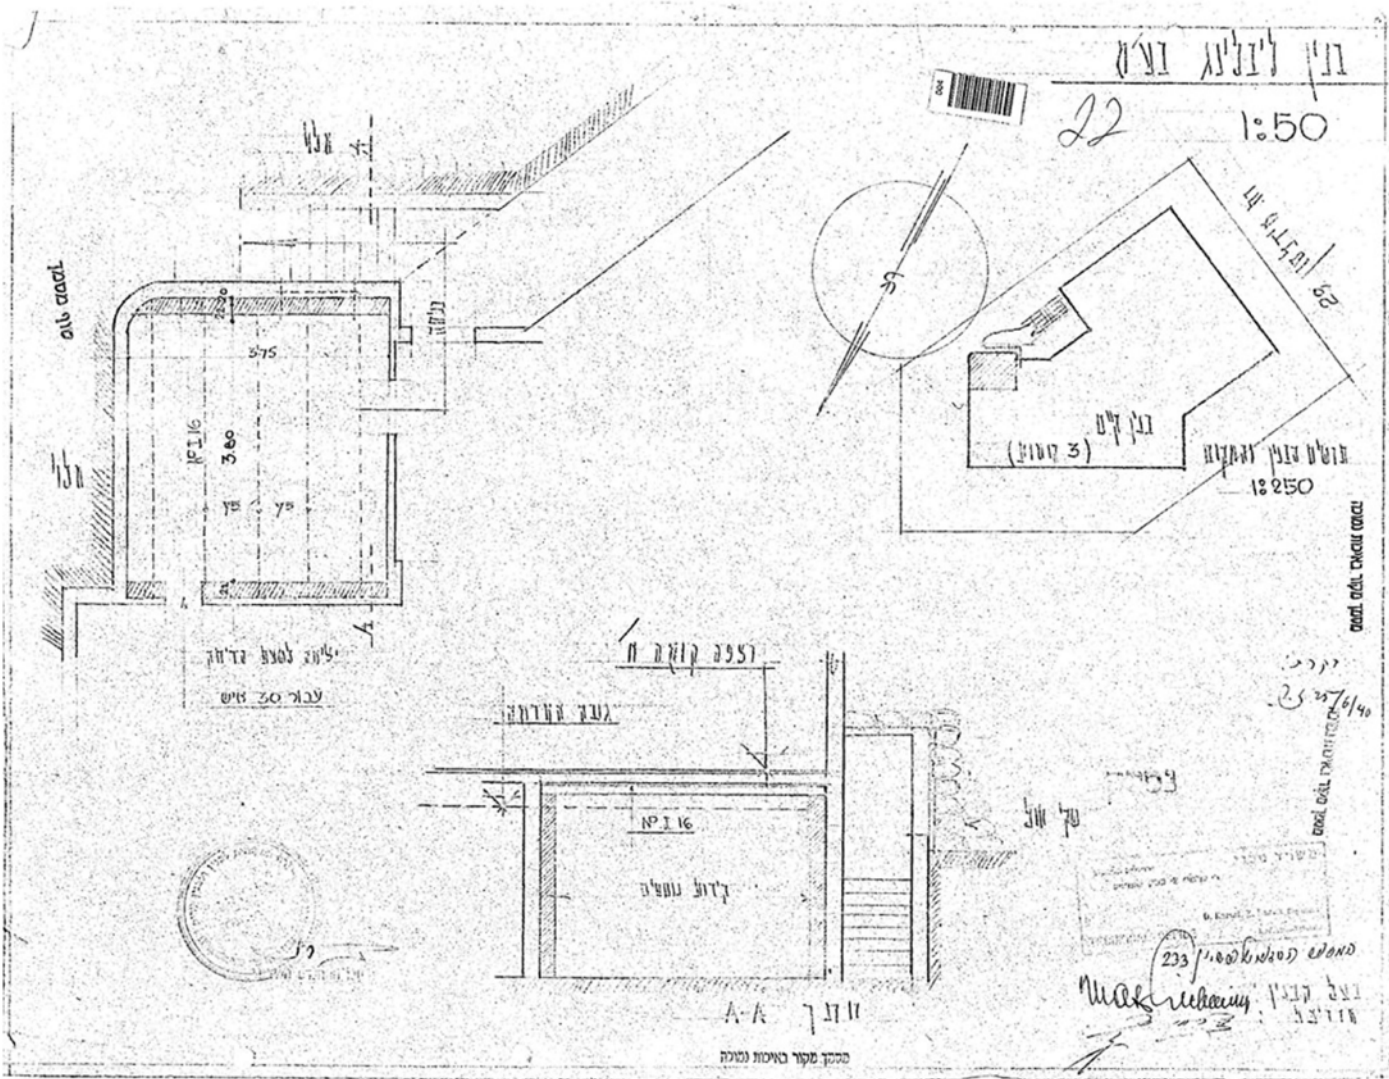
Strengthening walls in the air raid shelter (room -1.C), plan 1940
